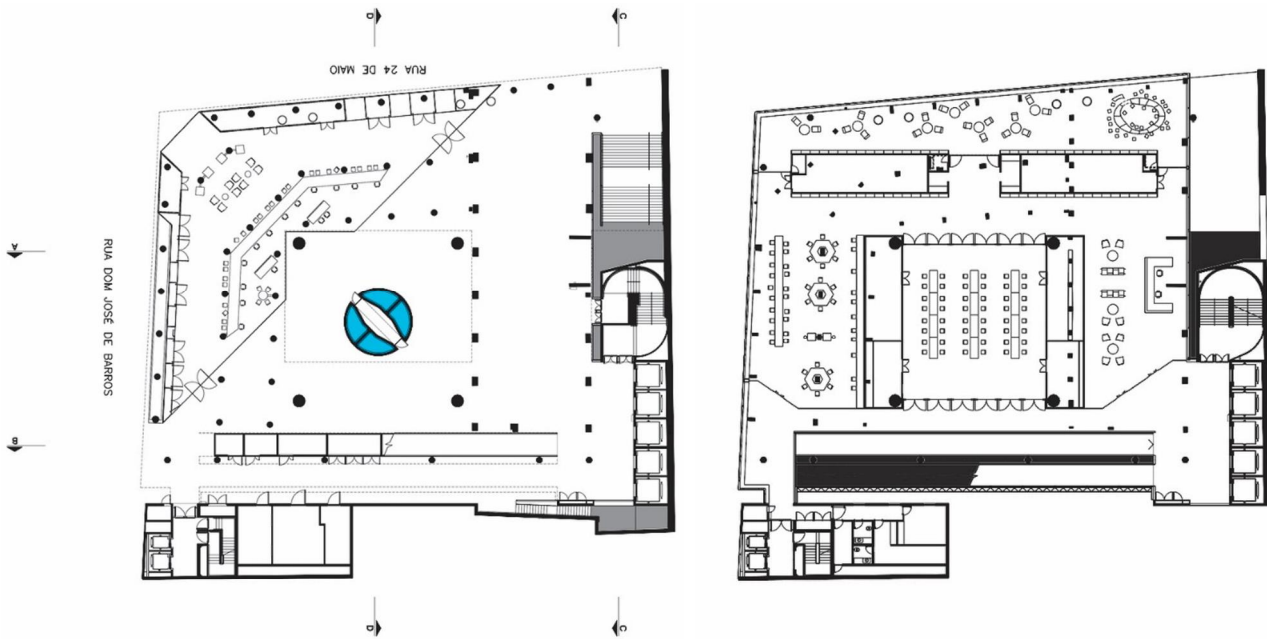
(left) Ground floor plan (Archdaily, 2018) Figure 5.2.6 (right) Fourth floor plan (Archdaily, 2018).
